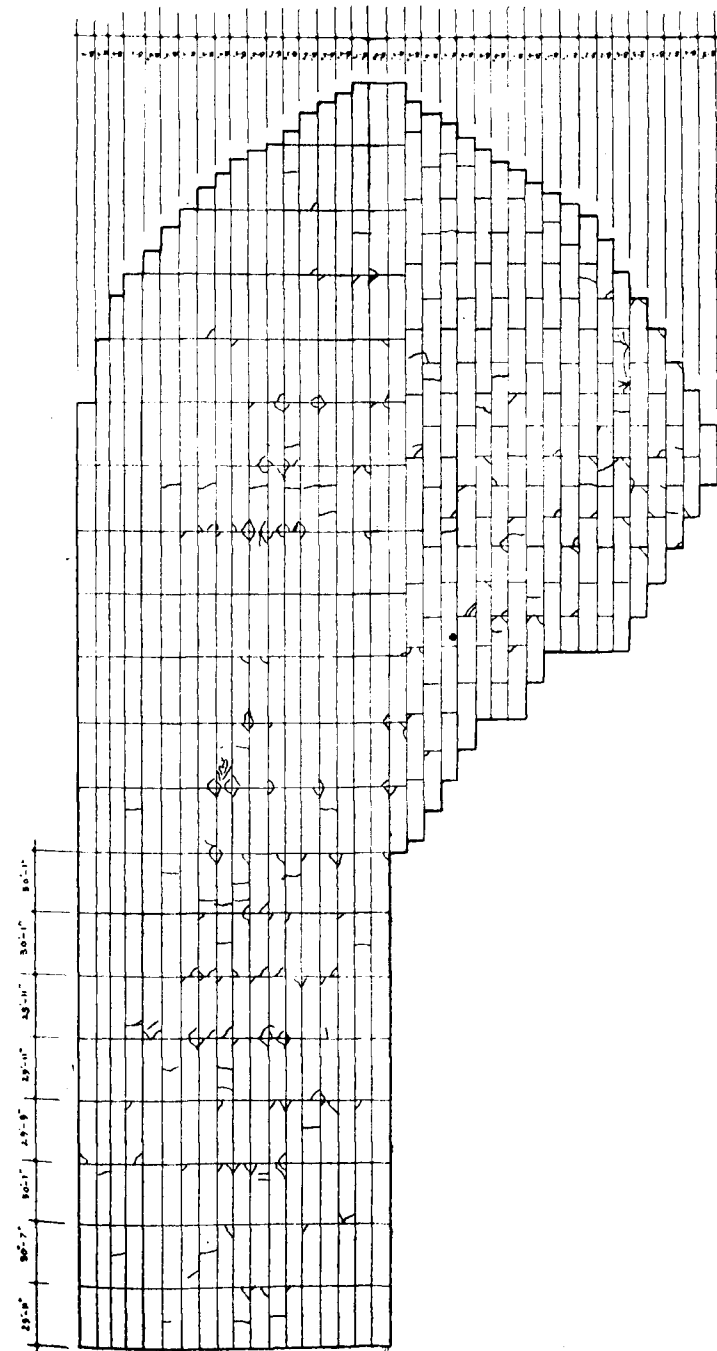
Details of old runway pavement slabs at Hakimpet showing the position and pattern of cracks from western end of runway
